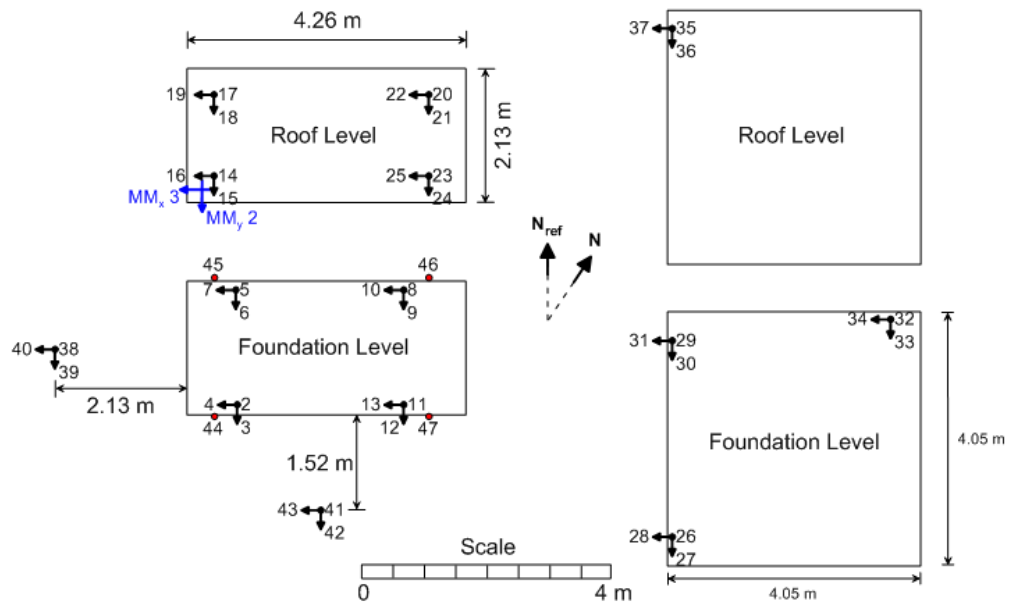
Sketch showing the structures location and sensor arrays for testing at GVDA.
